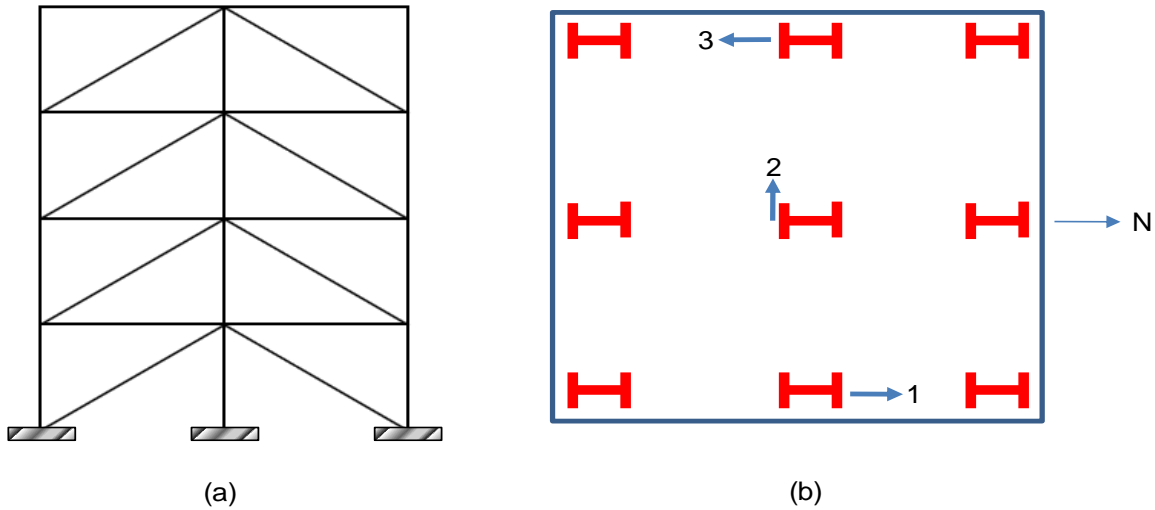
Geometry of the ASCE benchmark structure (a) vertical elevation and (b) floor plan (numbering is for the first floor sensors, the pattern continues in the subsequent floors and 3 sensors per floor).
